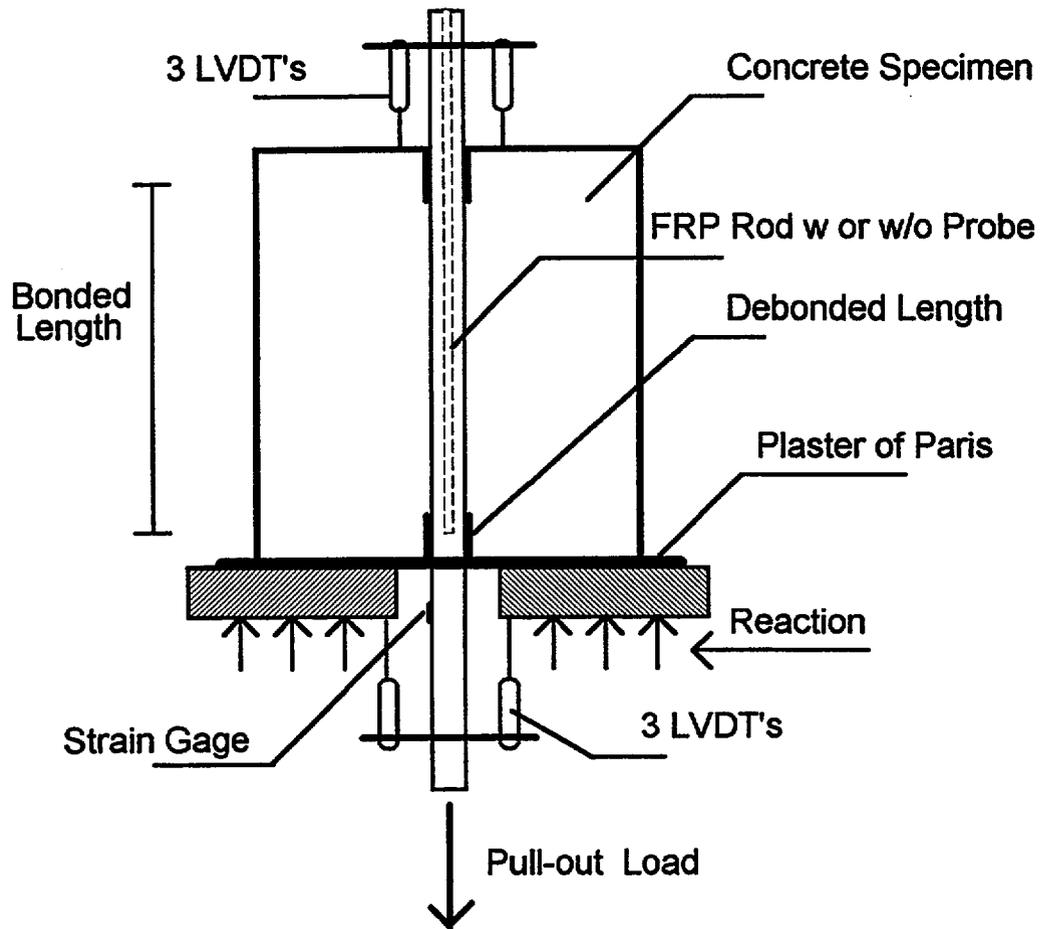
Test set-up for direct pull-out testing of FRP rebar in concrete [52].
